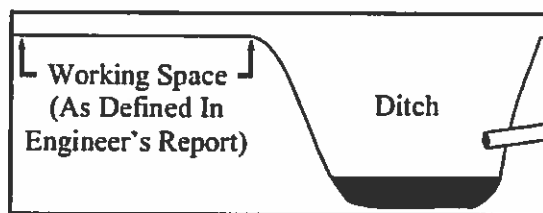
Cross-Section of an Open Ditch Municipal Drain.
